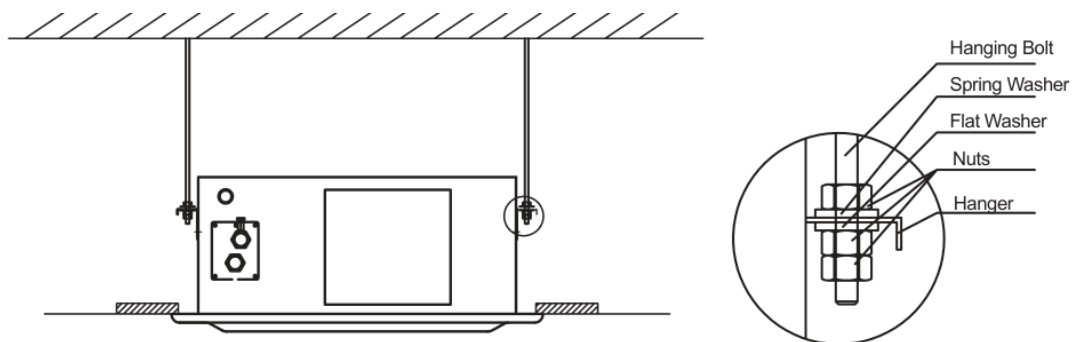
Suspension bolt, spring washer, flat washer, nuts and hanger
